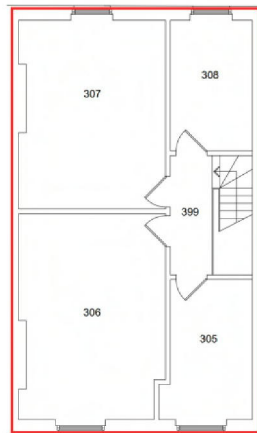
Level 3 Floorplan (extract from drawing ref. 163/164-01-5)
